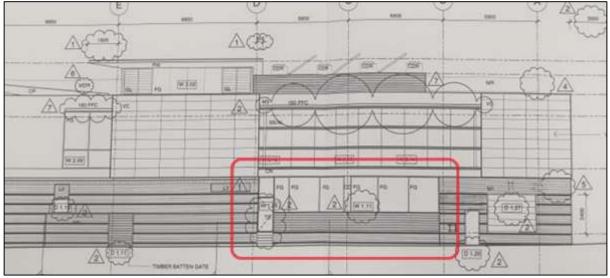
Extract of the provided western elevation with the subject development area outlined.
